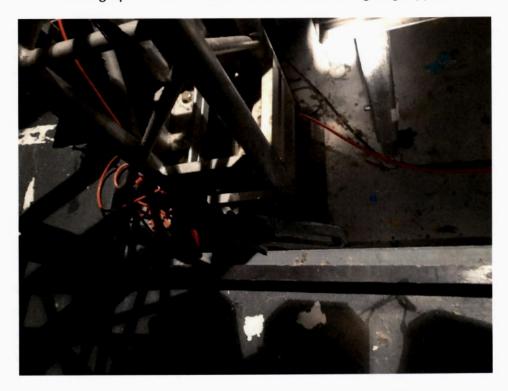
Aluminum Truss Frame for Lighting Support
